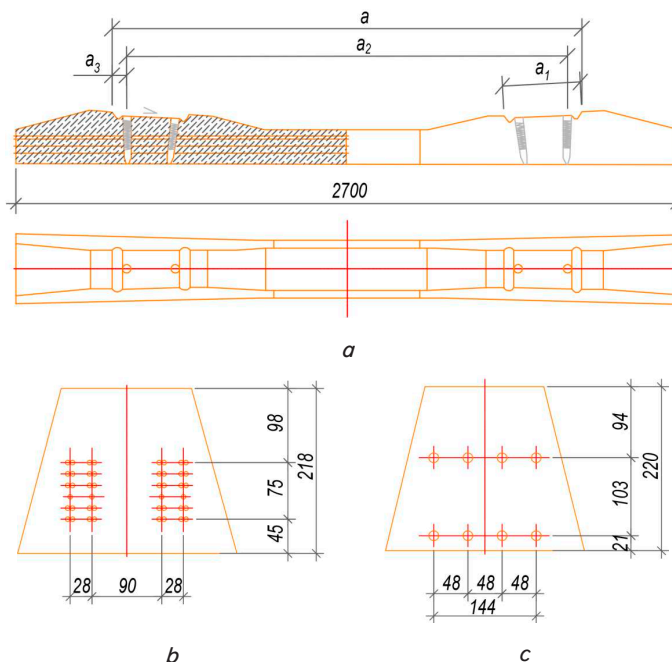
Concrete sleepers with pre-stressed reinforcement: *a* – sleeper design for screw-dowel intermediate rail fastening (Vossloh System W30, etc.); *b* – under-rail cross-section of sleepers with steel wire reinforcement; *c* – under-rail cross-section of sleepers with composite reinforcement
